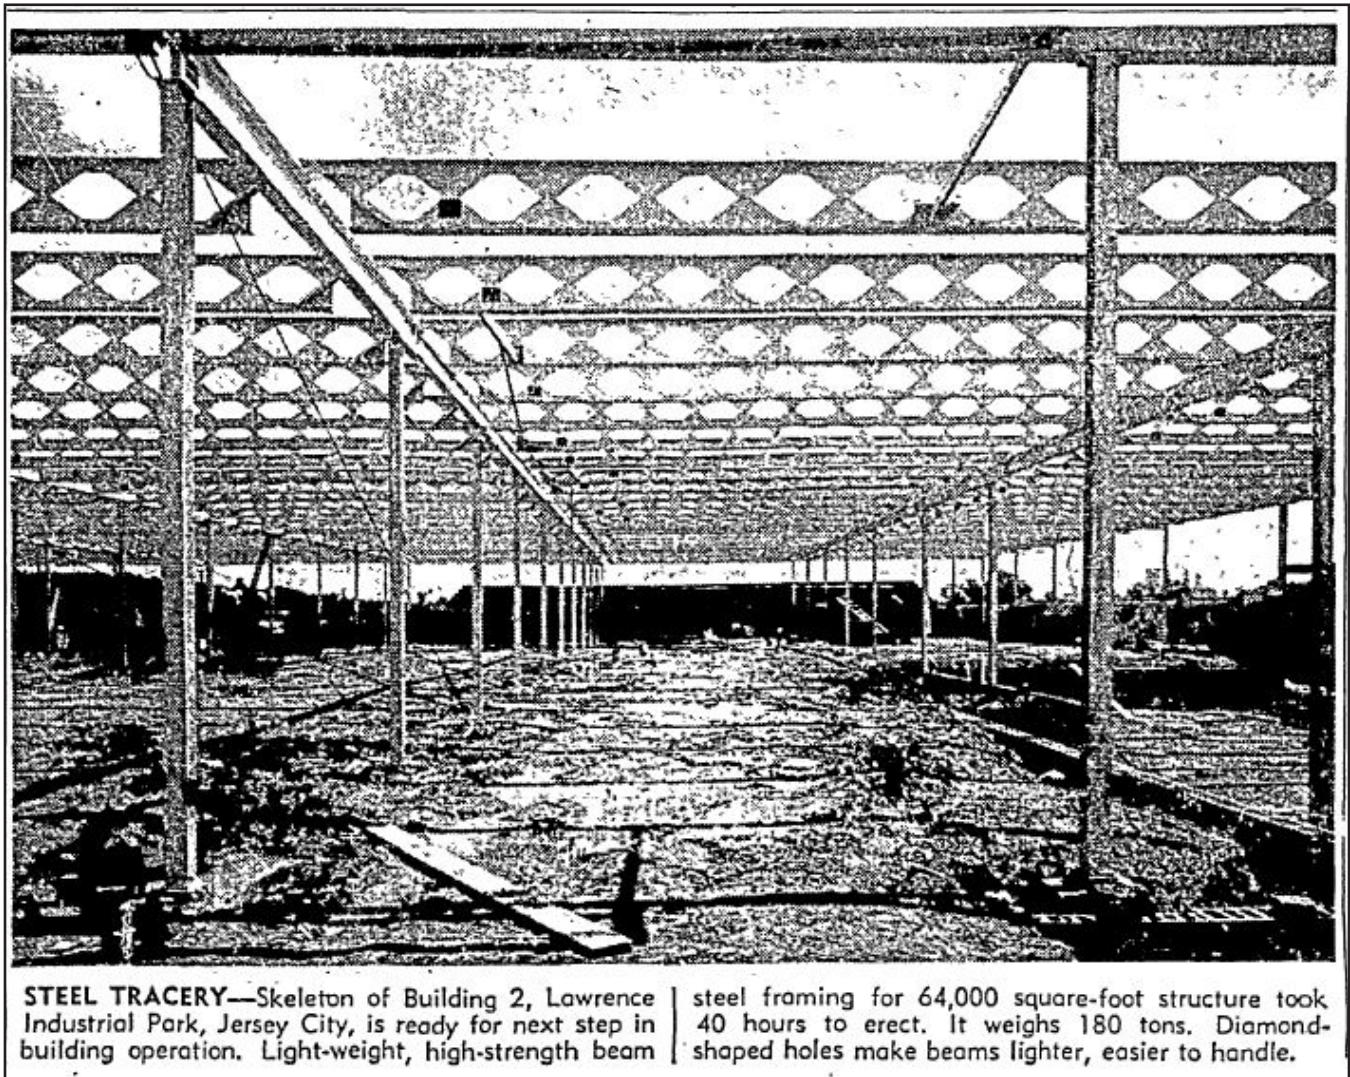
1960 photograph of the structural steel framing of the subject building at 20 Linden Avenue East during its construction phase (The Jersey Journal 29 July 1960).
